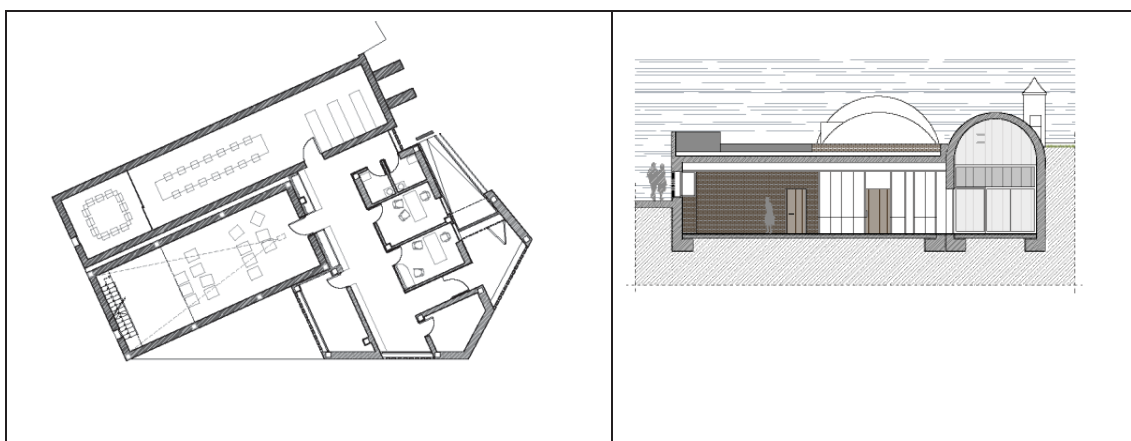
Plan and sections of the Aljibes de Hurchillo.
